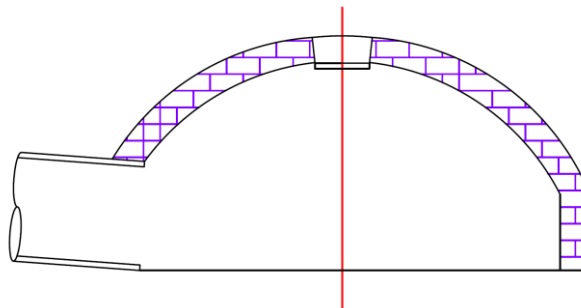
Drainage Pipe to Sandstone Arch Connection (Hydro-Future, 2015)
